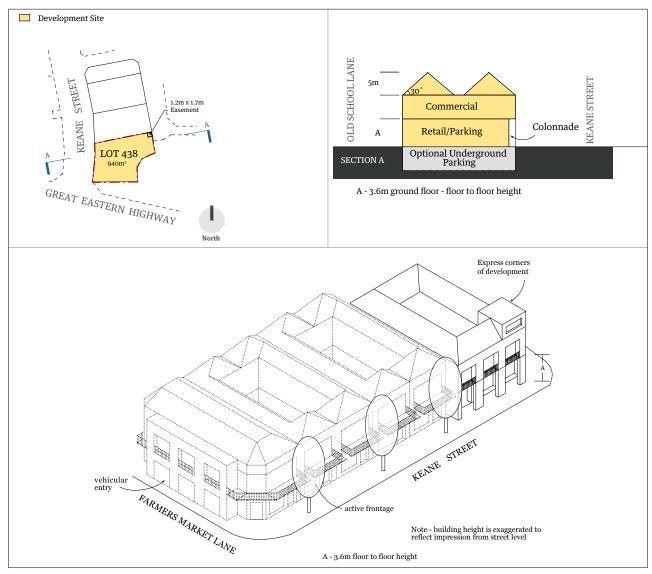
SITE H (SOUTHERN LOT) SITE SPECIFIC PLAN
